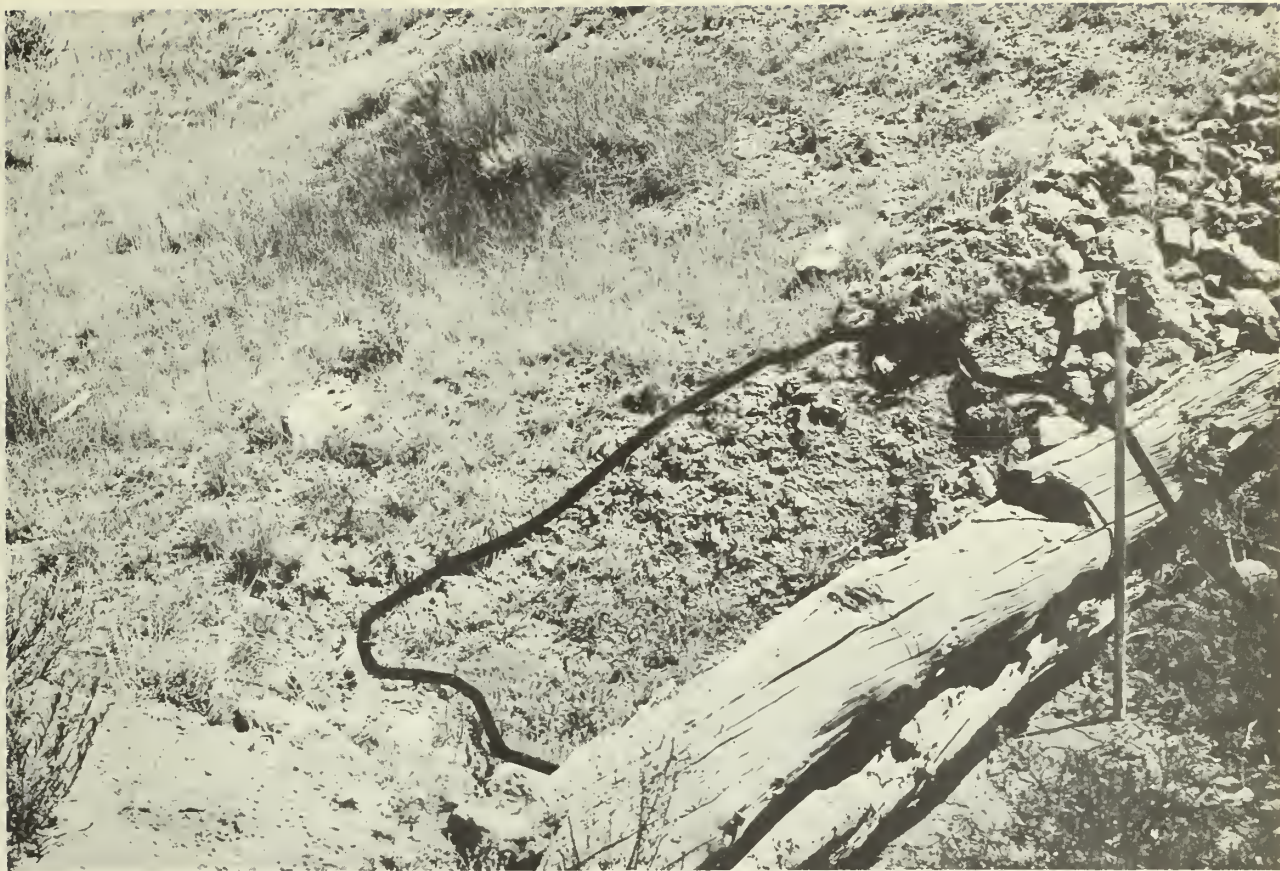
At a distance of 210 feet below the last masonry structure a headcut in the channel bottom undermined check dam No. 37 to a depth of 1 foot. (Height of rod = 5.5 feet.)
